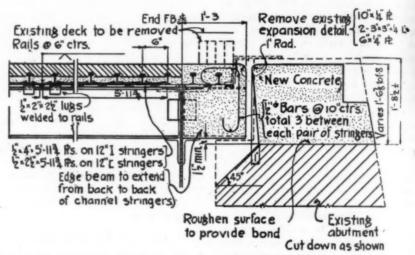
Cross section through old floor and new, showing use of 30-lb. scrap tail at 6-in.
